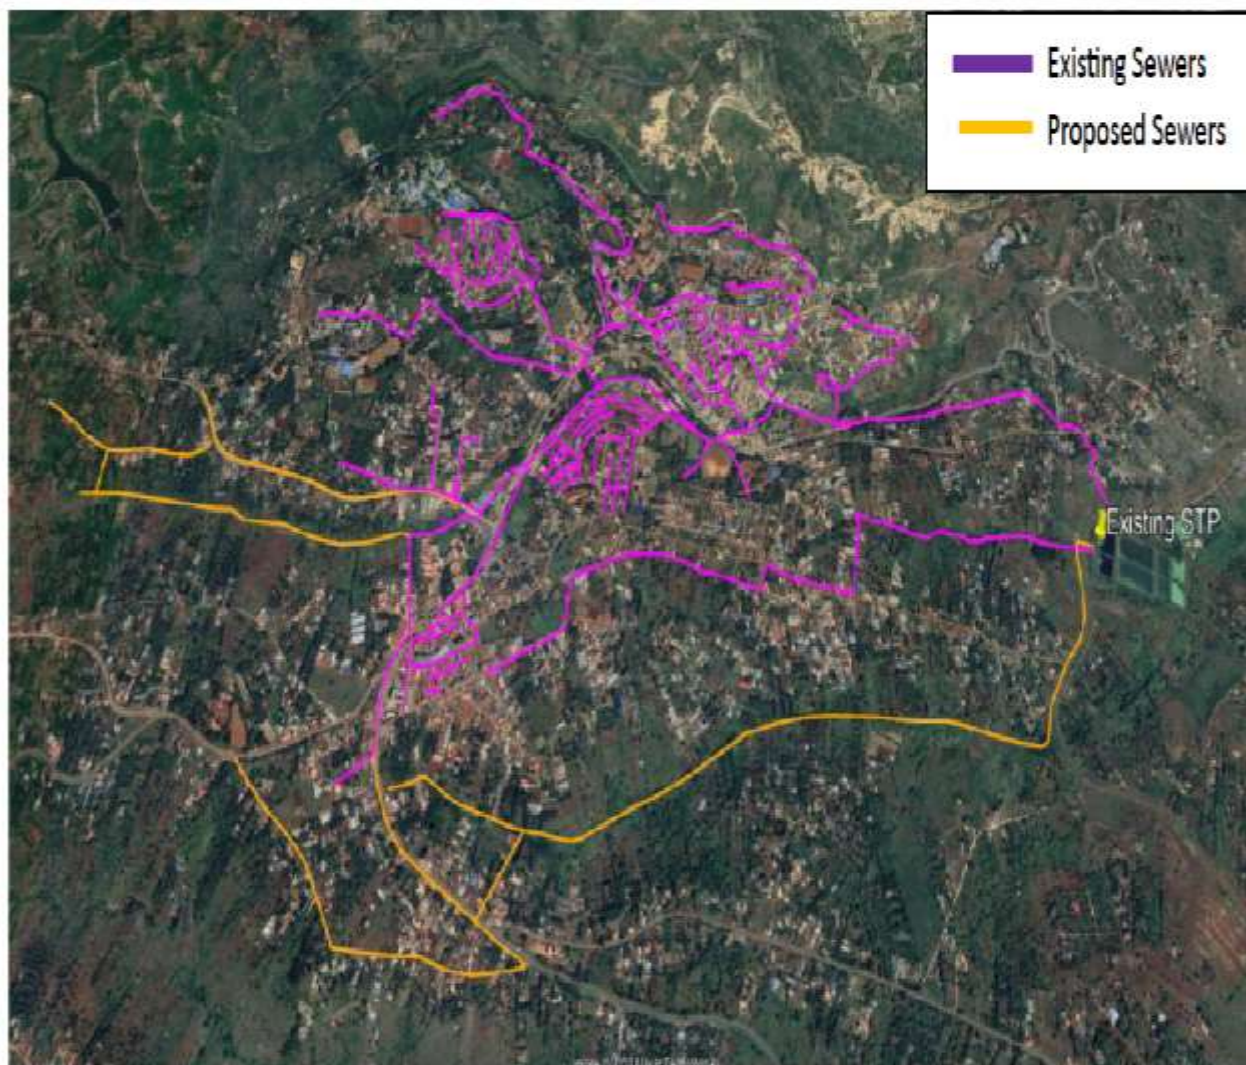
Layout of proposed Sewer extensions for Murang'a Town
